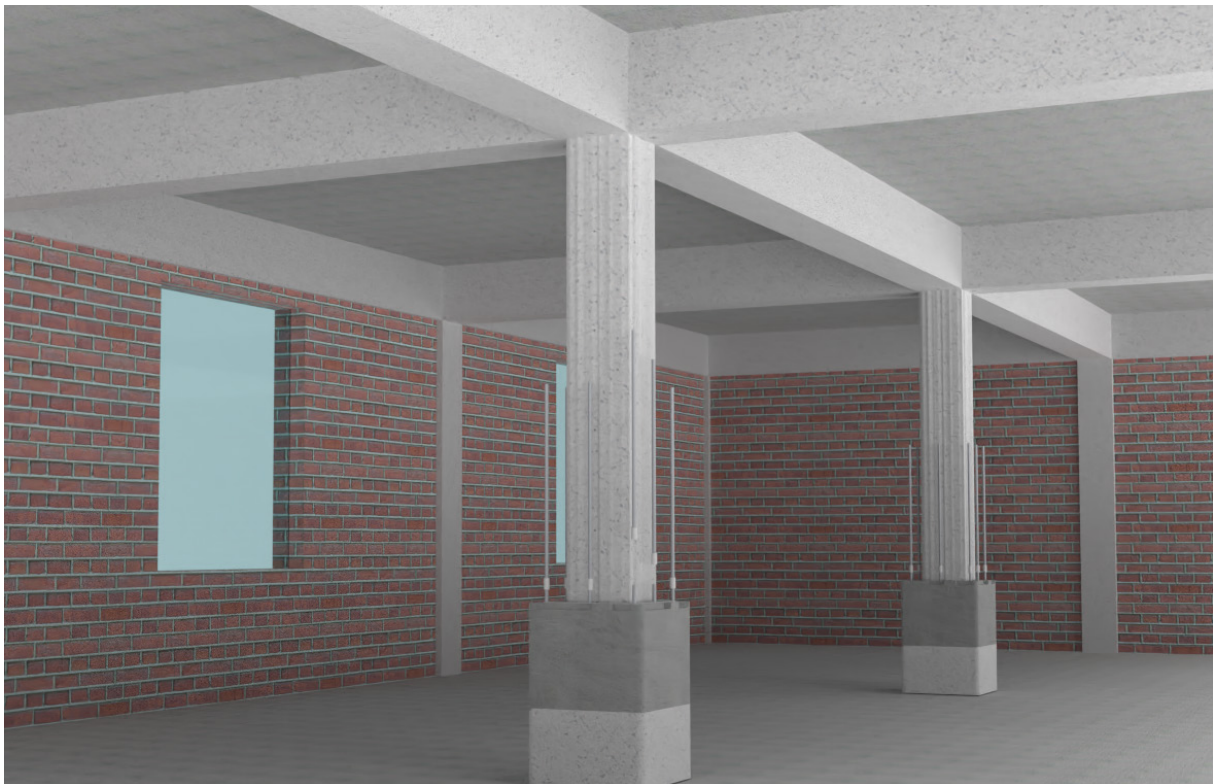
Step 7: Once the bottom blocks are in place, the first stirrup element is placed in the horizontal grooves of the block elements, in order to confine the system.
